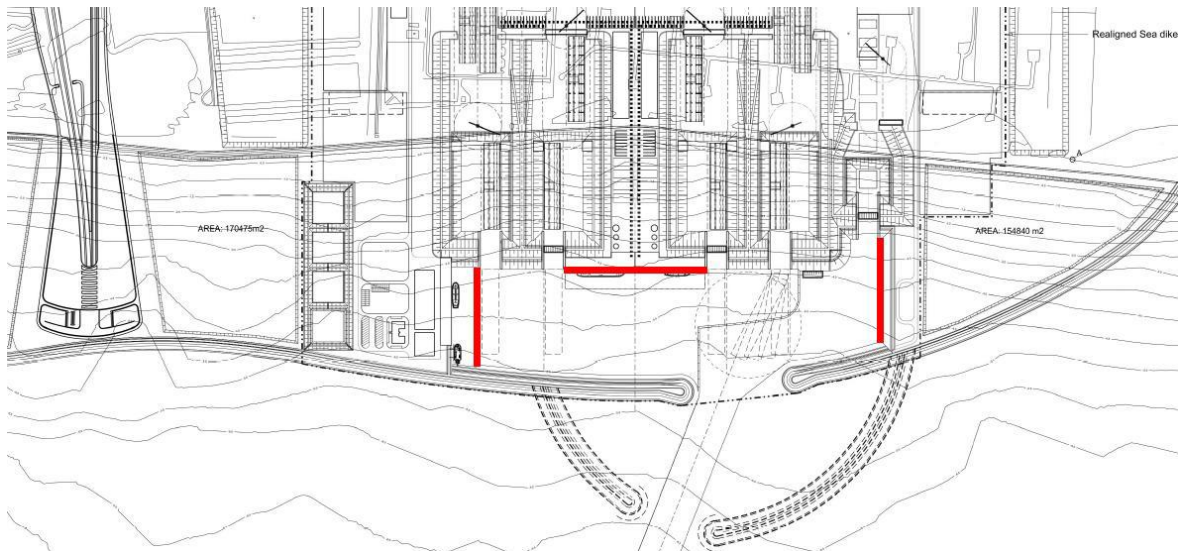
Piling quay walls from sea side. Source: Rambøll (2011)
